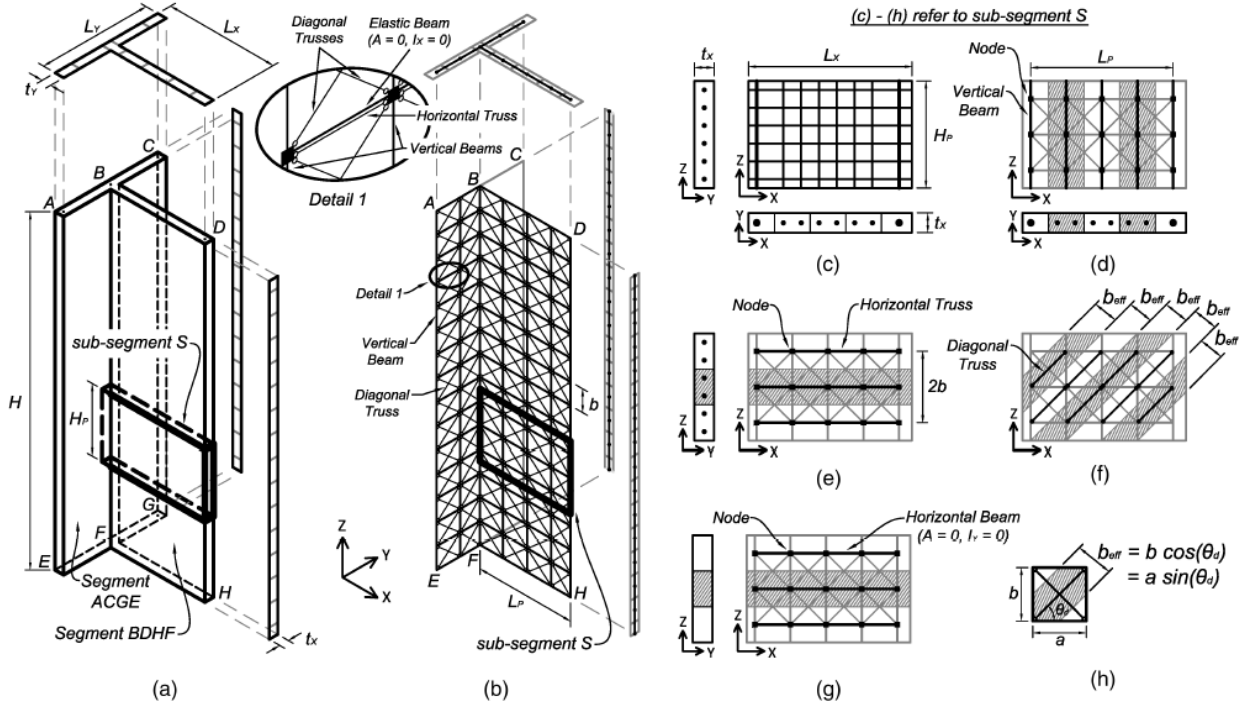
Beam-Truss Model (Lu and Panagiotou 2013)
